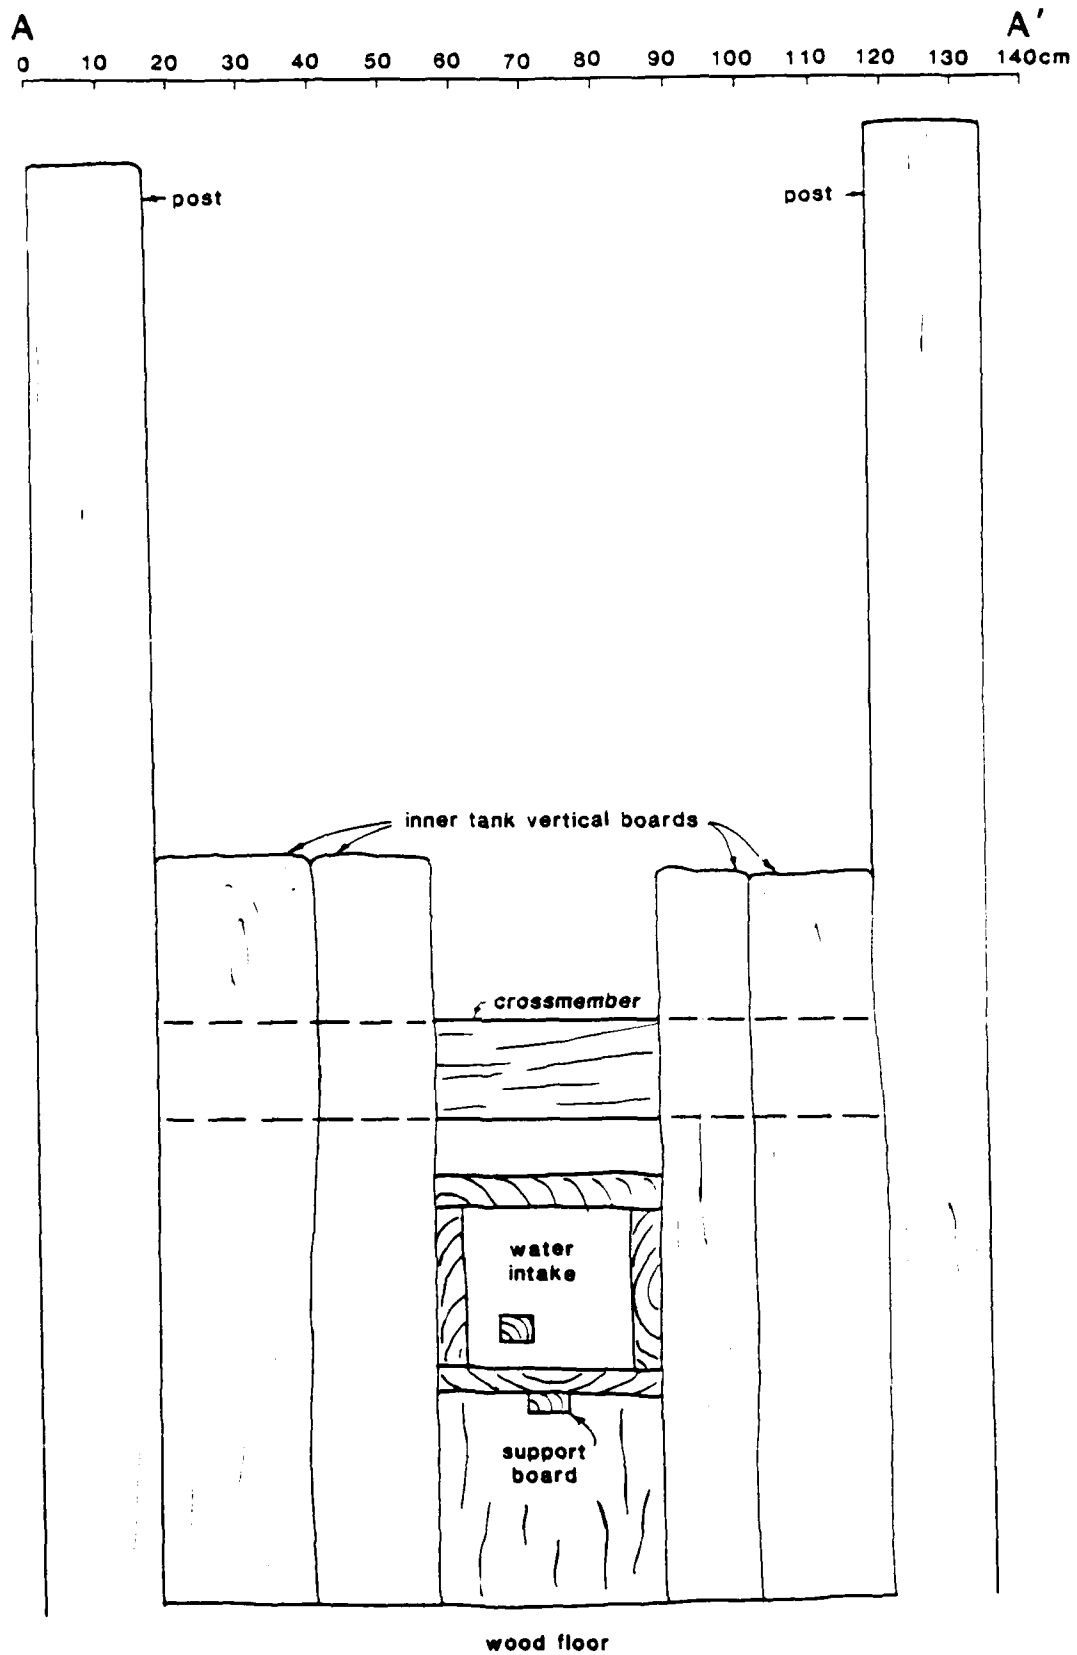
Profile A-A' in Feature 2, showing north interior wall of retainer tank.
